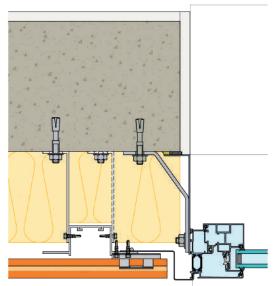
DETAIL : WINDOW FRAME FLUSH WITH OUTSIDE WALL
